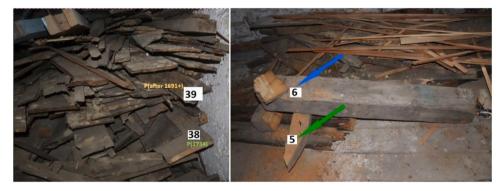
Timbers found in a pile stored on the floor of the narthex.
